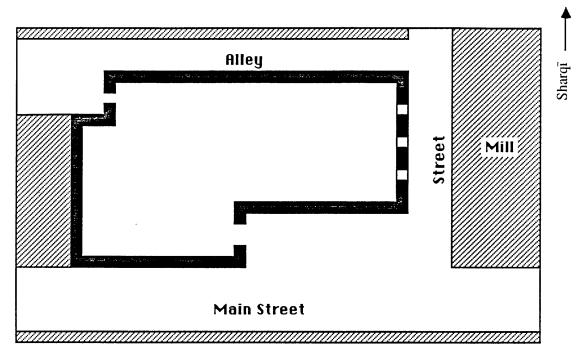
Plan of a hypothetical building with a jagged facade.
